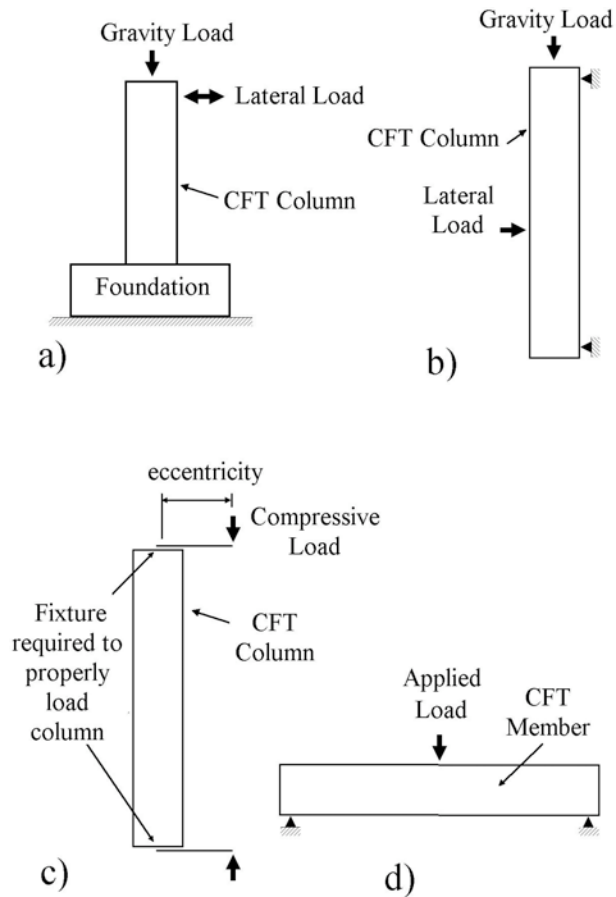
Schematic of CFT test configurations; a) connection test, b) beam-column test, c) eccentrically loaded column test, d) flexural test
